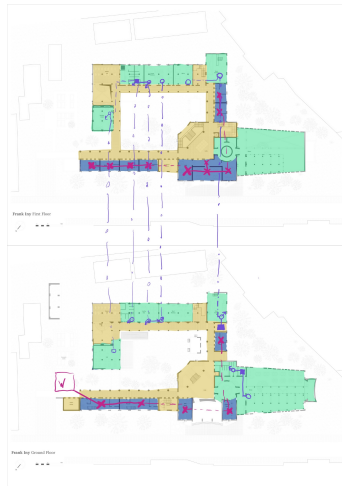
Climatic separation diagram: yellow, outdoor; green, air ventilation; blue, floor cooling (Source: by author).
